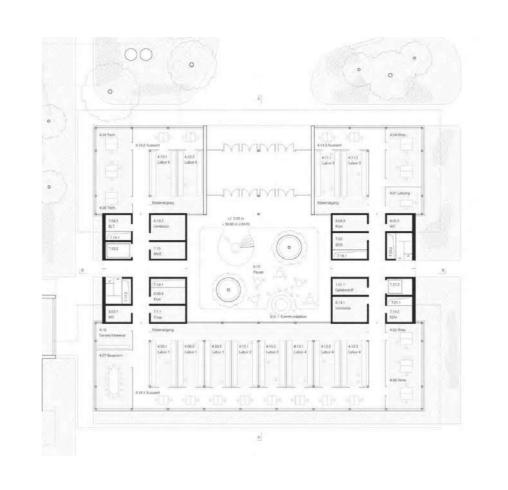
| Ground Floor | Floor plan | Scale 1:500 | © Schulz und Schulz Architekten
